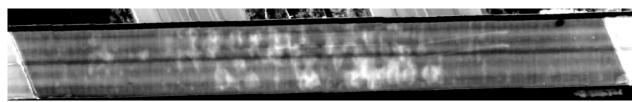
B670122 - Aerial Full Deck - 1,000 Feet Above Deck
